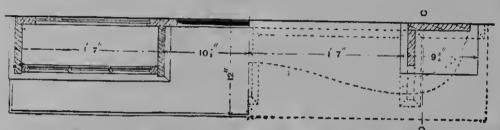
Half Sectional Plans of Chimney-piece and Cupboard Overmantel.
